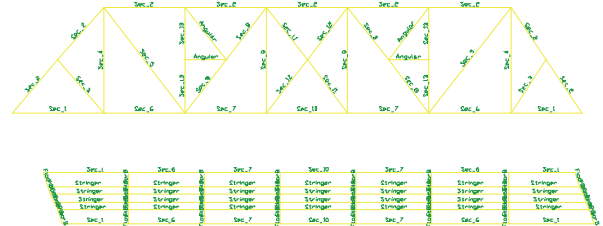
Elevation and plan view of bridge at Ft. Leonard Wood showing section names provided in Table 1.
